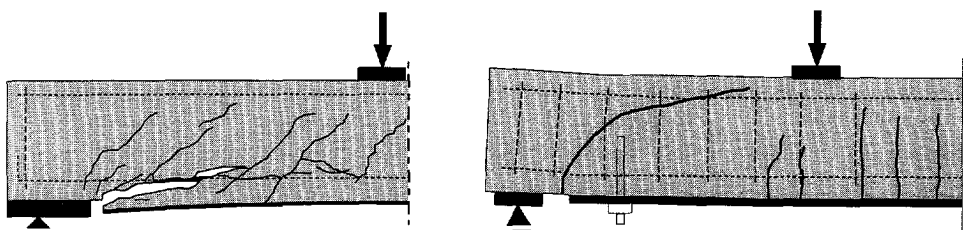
Typical modes of failure of members with externally bonded steel plates: plate separation (Oehlers [1989]⁸) and shear failure (Sharif et al. [1994a]¹⁰)
